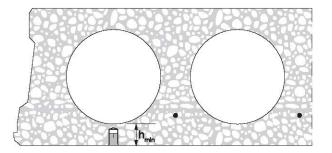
HILTI HDI-P TZ INSTALLATION PARAMETERS IN HOLLOW CORE CONCRETE PANELS
